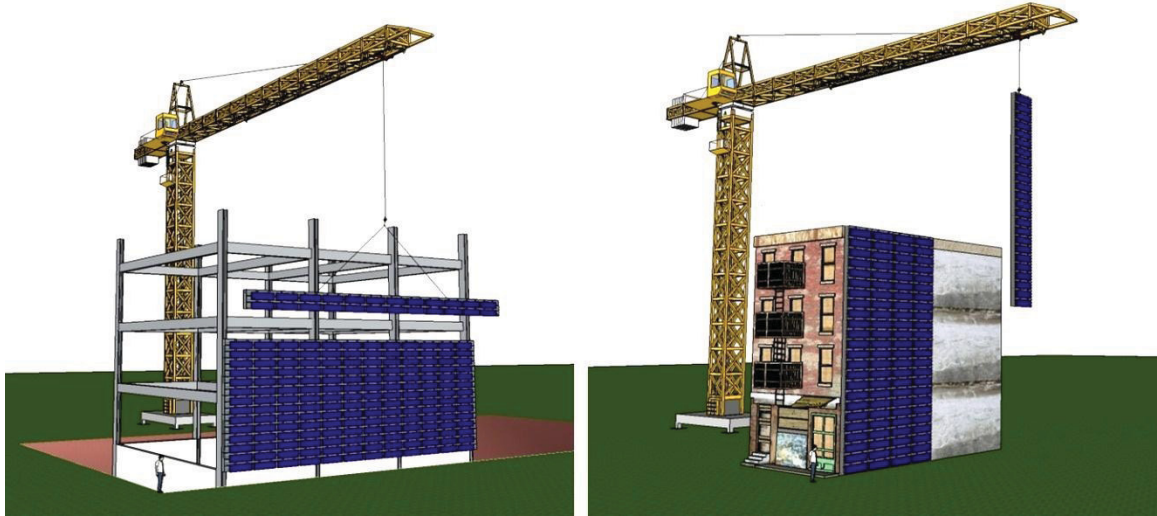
Installation of horizontal prefabricated BIPV/T modules for new construction (left). Retrofit of an old building façade using vertical prefabricated BIPV/T modules (right).
